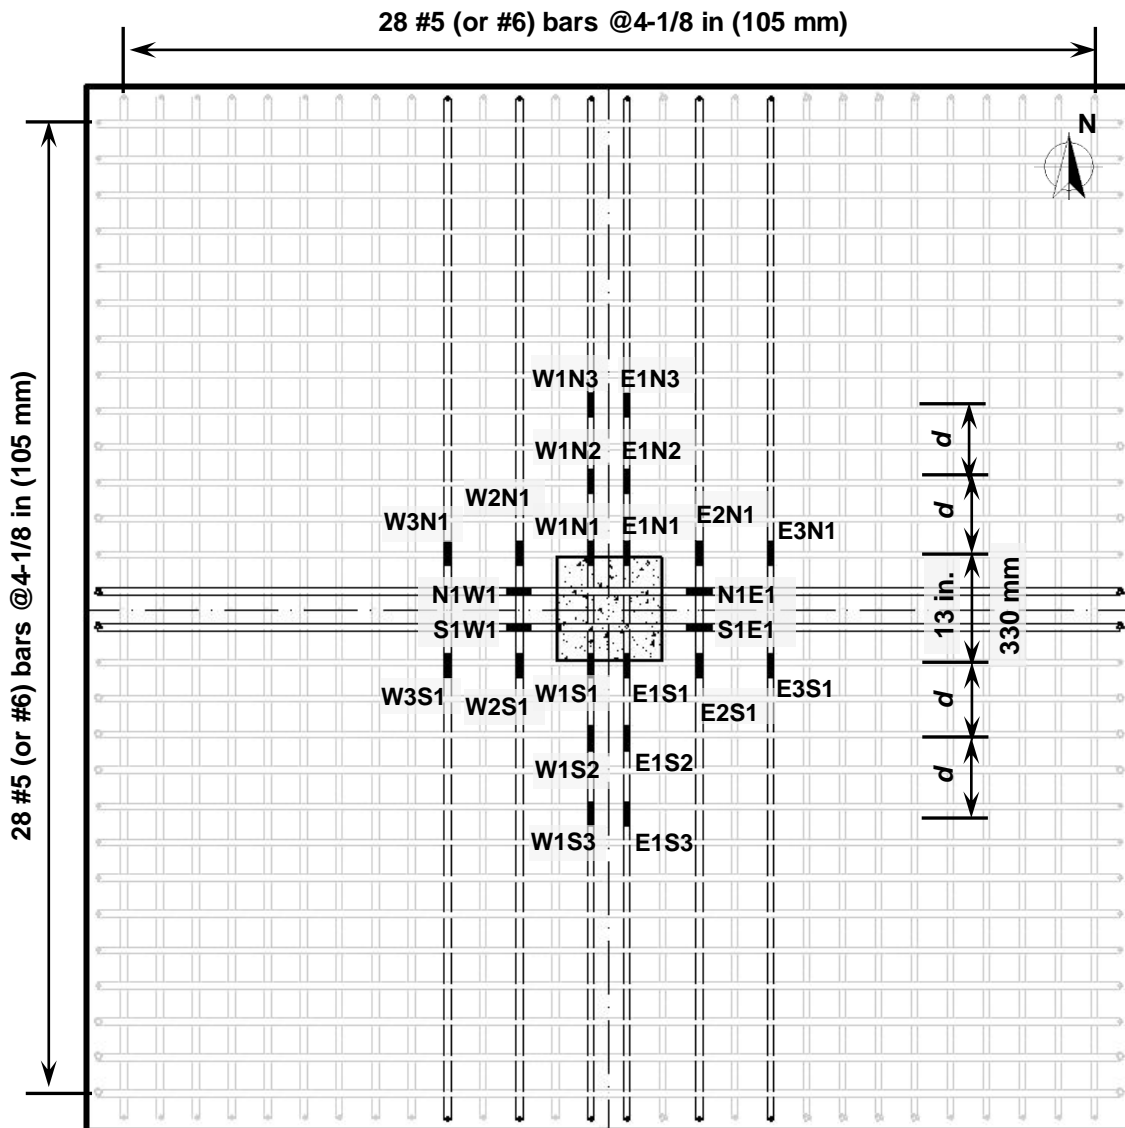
Typical strain gauge locations in slab flexural tension reinforcing bars (bottom)
